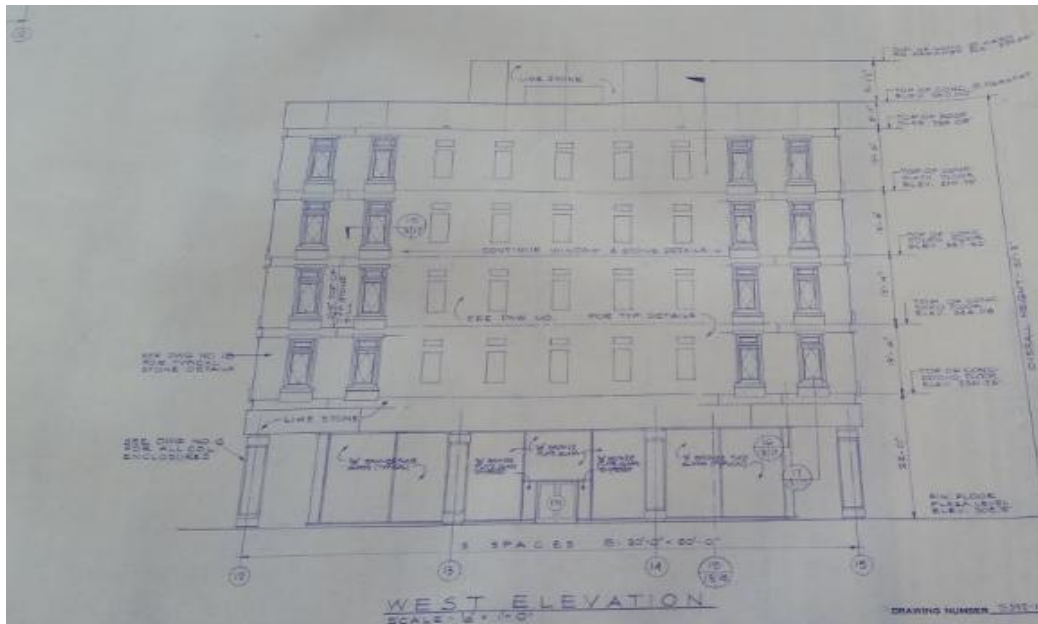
Plan of West Elevation of Blatt Building. From File Unit 6, Container 10, Series 112021, SCDAH.
